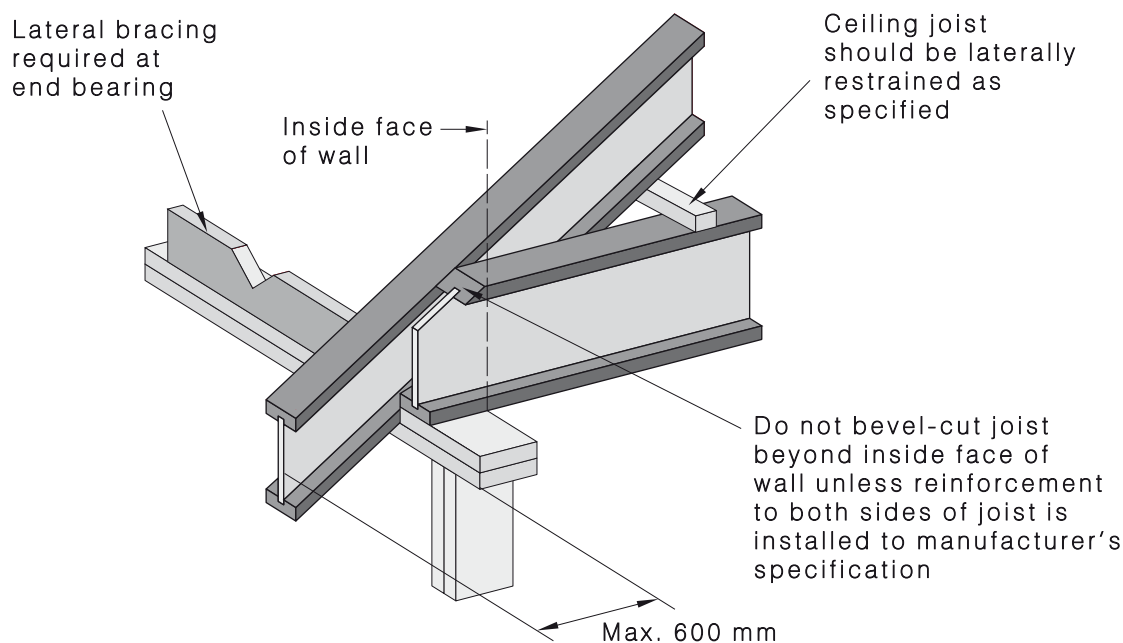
BEVEL CUTS ON CEILING JOISTS
